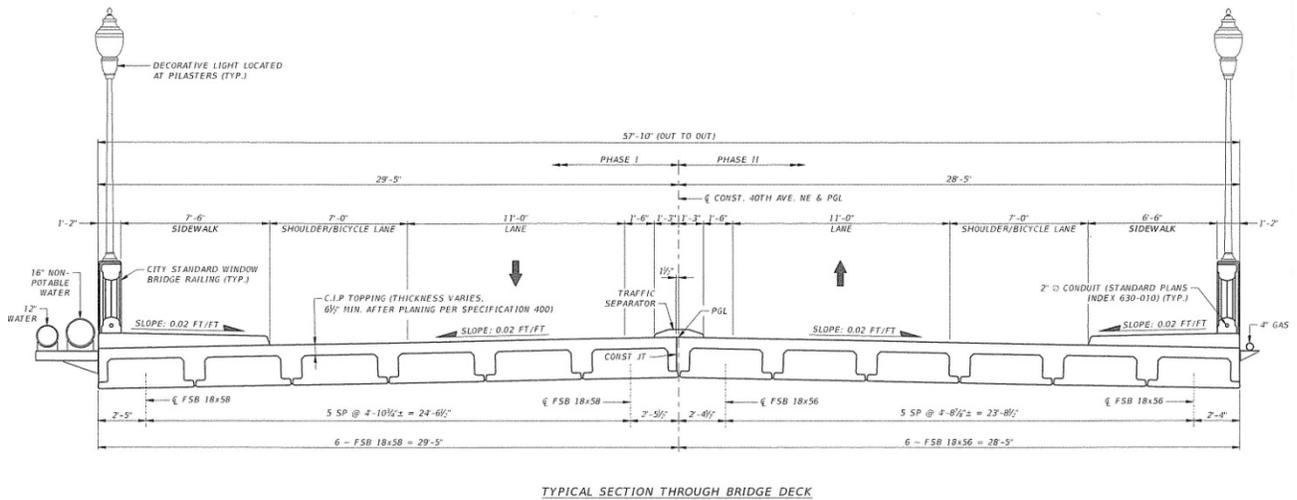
40th Avenue NE Bridge Proposed Typical Section
